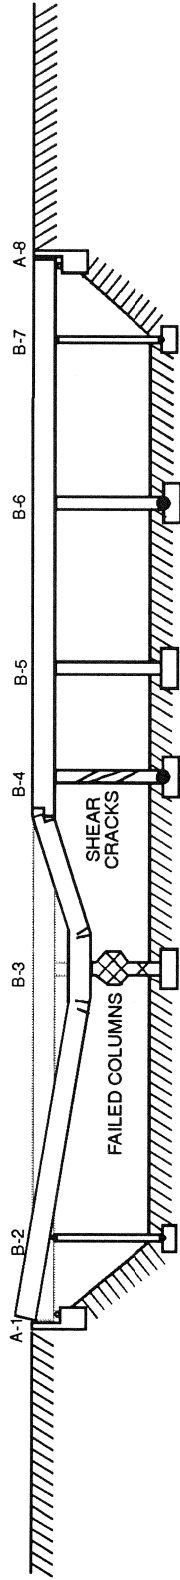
Fairfax-Washington Undercrossing -
